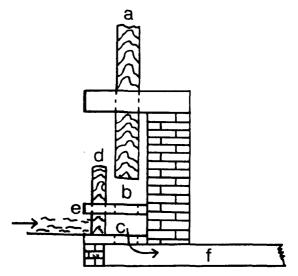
Sluice at the Reservoir to the North of Rāmnāḍ. The drawing demonstrates the layout of the sluices mechanism. The outlet conduit (f) is placed below the sill of the sluice. The outflow of water could be regulated by lowering the piston (a) through the circular apertures (b, c) till it rested on the floor of the outlet conduit. When the level of water in the reservoir fell below point e, a wooden slab (d) lowered through the rectangular aperture of the stone slab (e) could be used as an alternative regulating device.
